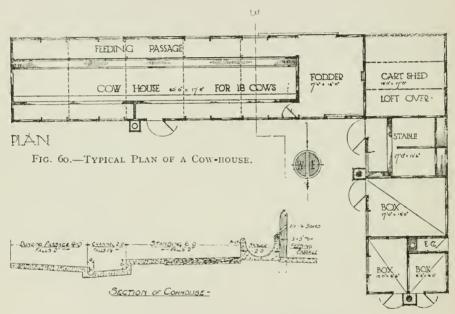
FLOOR SECTION FOR COW-HOUSE.
